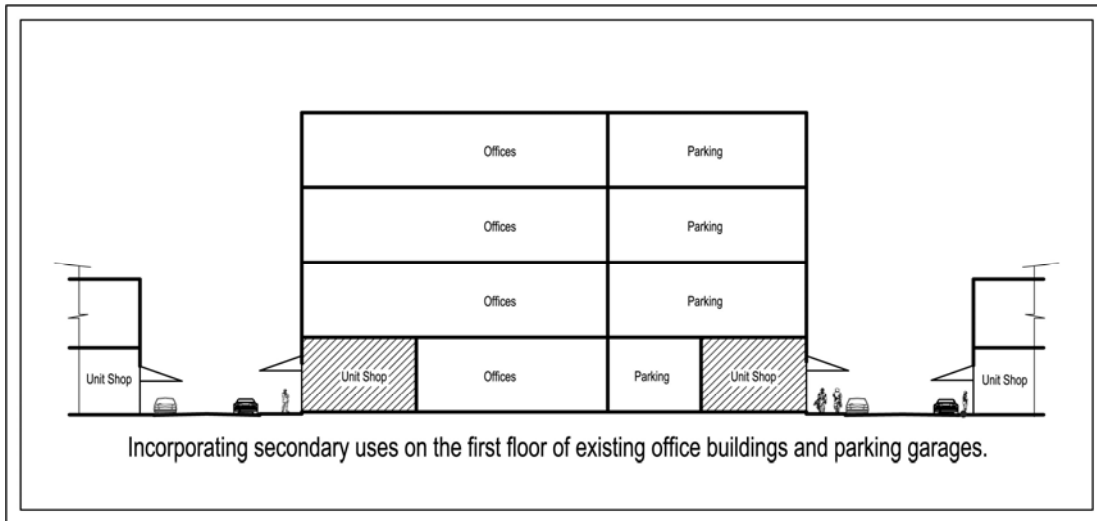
Conceptual section illustrating incorporation of secondary uses within existing offices and parking garages at ground level (Source: Drawn by author).
